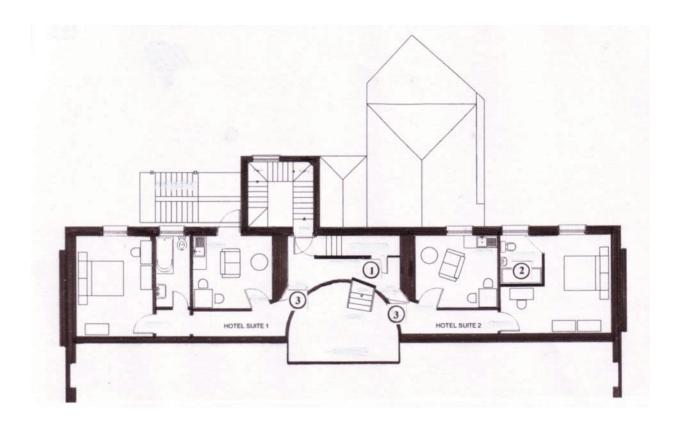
Plan: Second Floor, rear section, showing numbered locations of proposed works.
